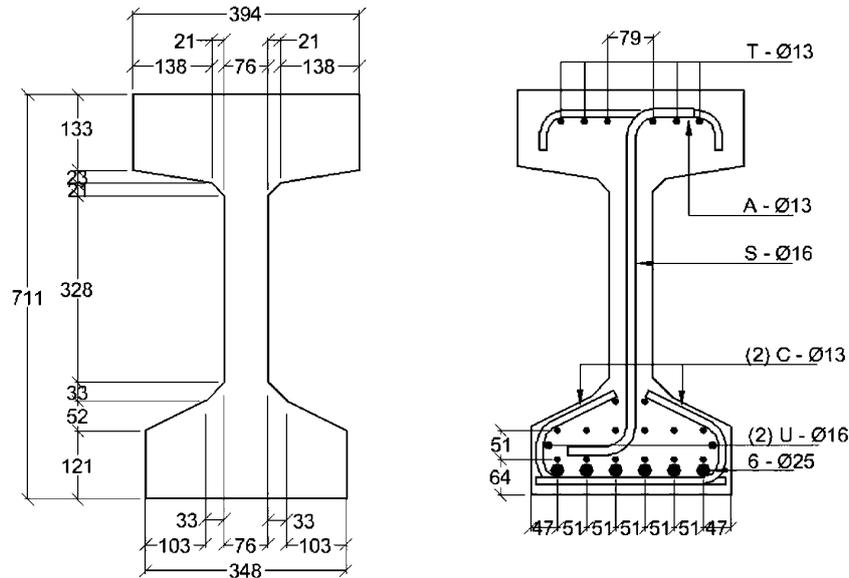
Cross-section and reinforcement details for modified Tx28 Girders A1, A2, F1 to F4 and C3 (All dimensions are in mm).
